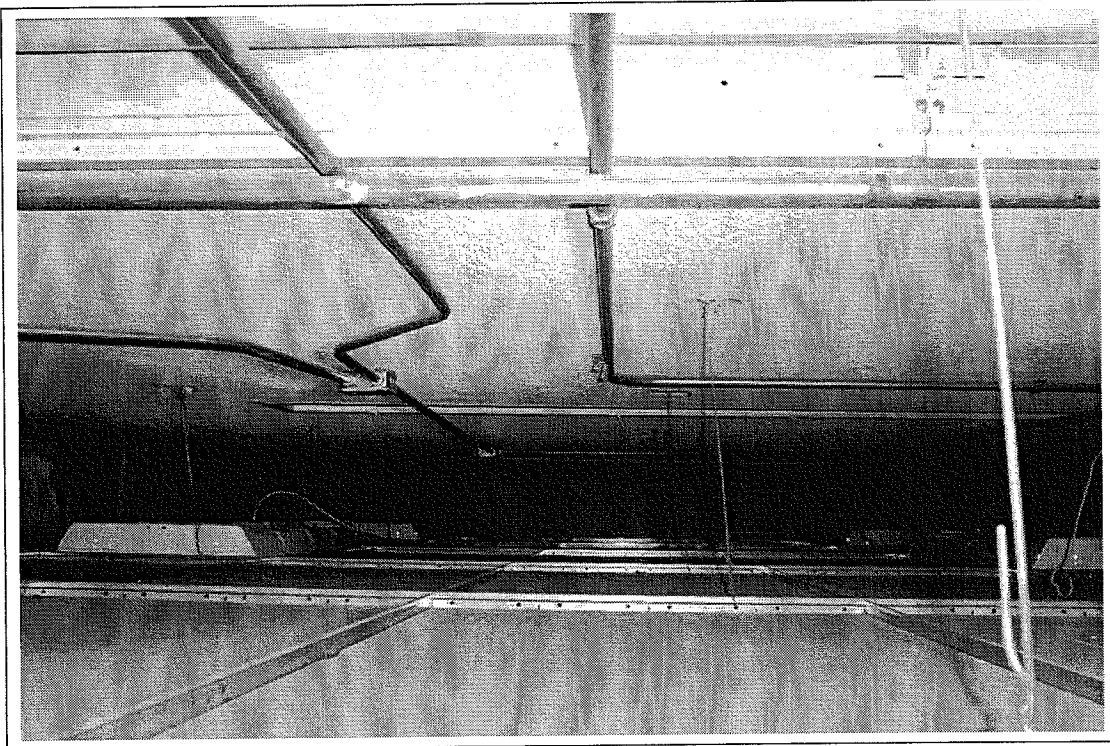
1st floor, City Counsel Chambers - General view of hanger wires and electrical conduit attached to acoustical sprayed ceiling
